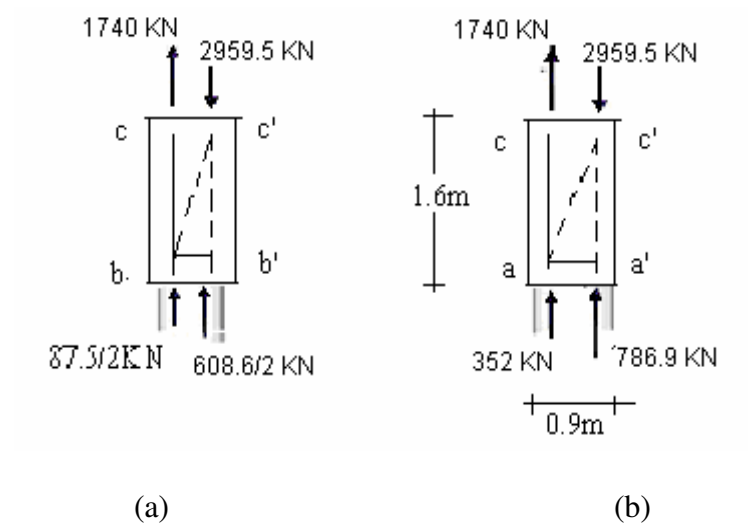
column type truss due to the adjoining simple truss in region near column 1
